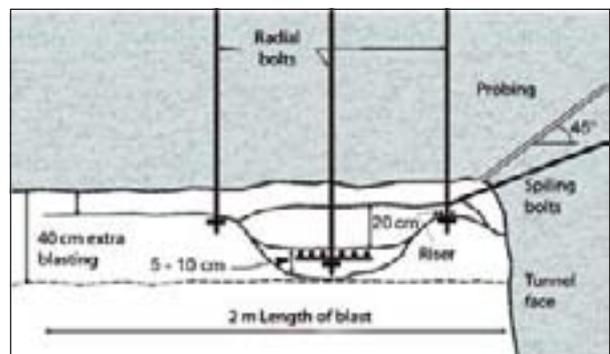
Instalment of spiling bolts, probing for inspection of rock coverage, and support using reinforced sprayed concrete arcs.
